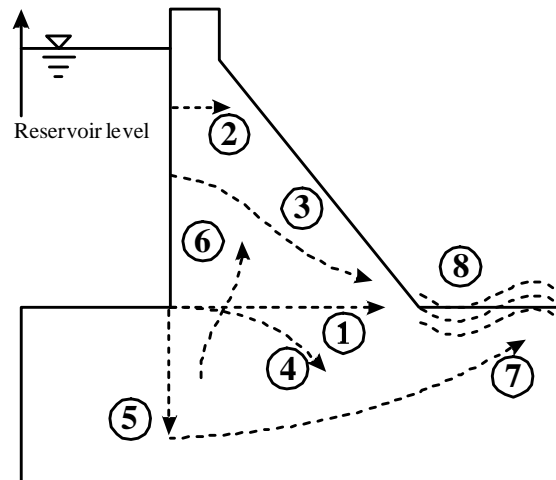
Failure mechanisms of gravity dams (1,2 horizontal cracks, 3,4 curvilinear cracks, 5 vertical foundation crack, 6 extension of existing foundation discontinuity in dam body, 7 sliding in foundation, 8 buckling failure of thin bedded strata).
